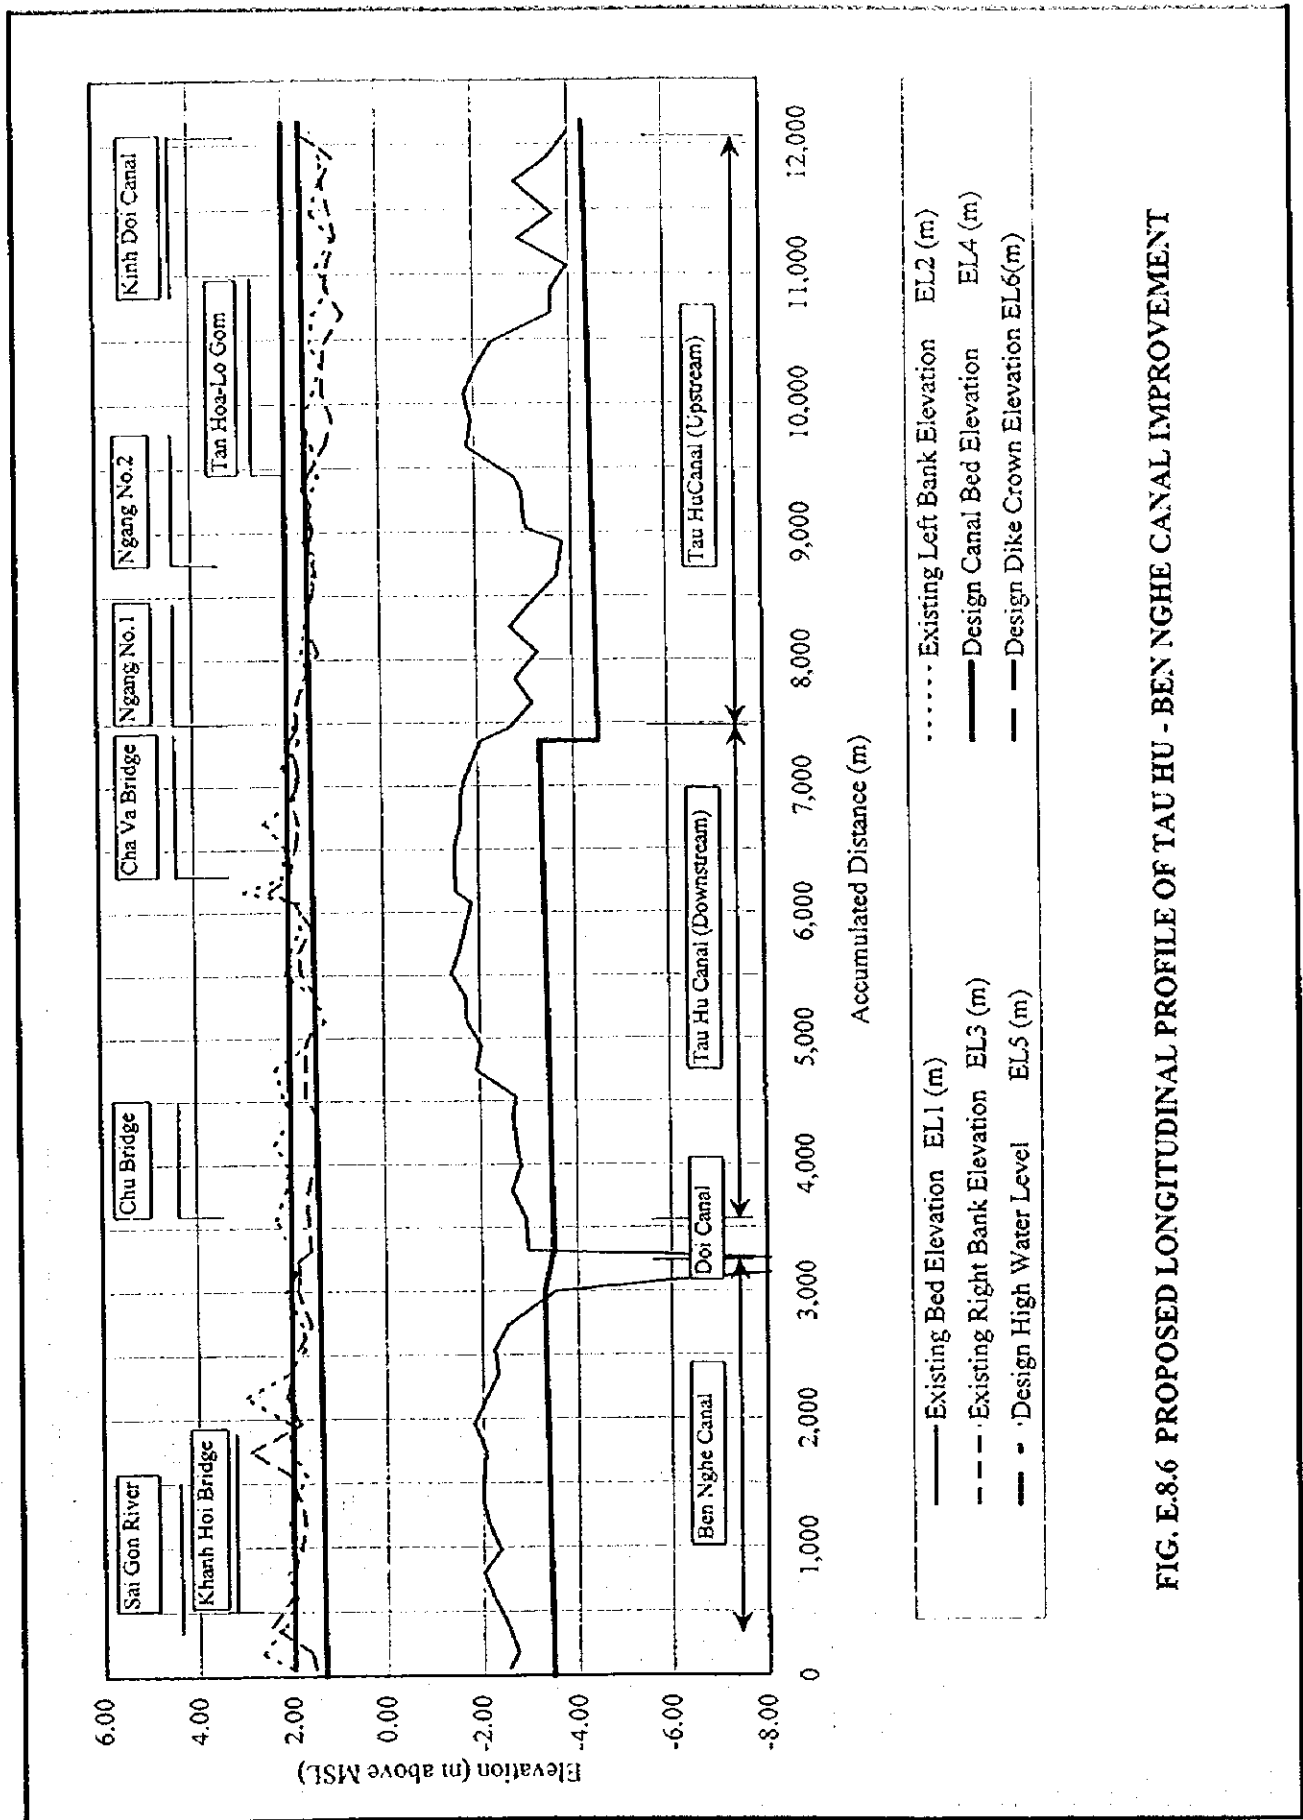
PROPOSED LONGITUDINAL PROFILE OF TAU HU - BEN NGHE CANAL IMPROVEMENT
